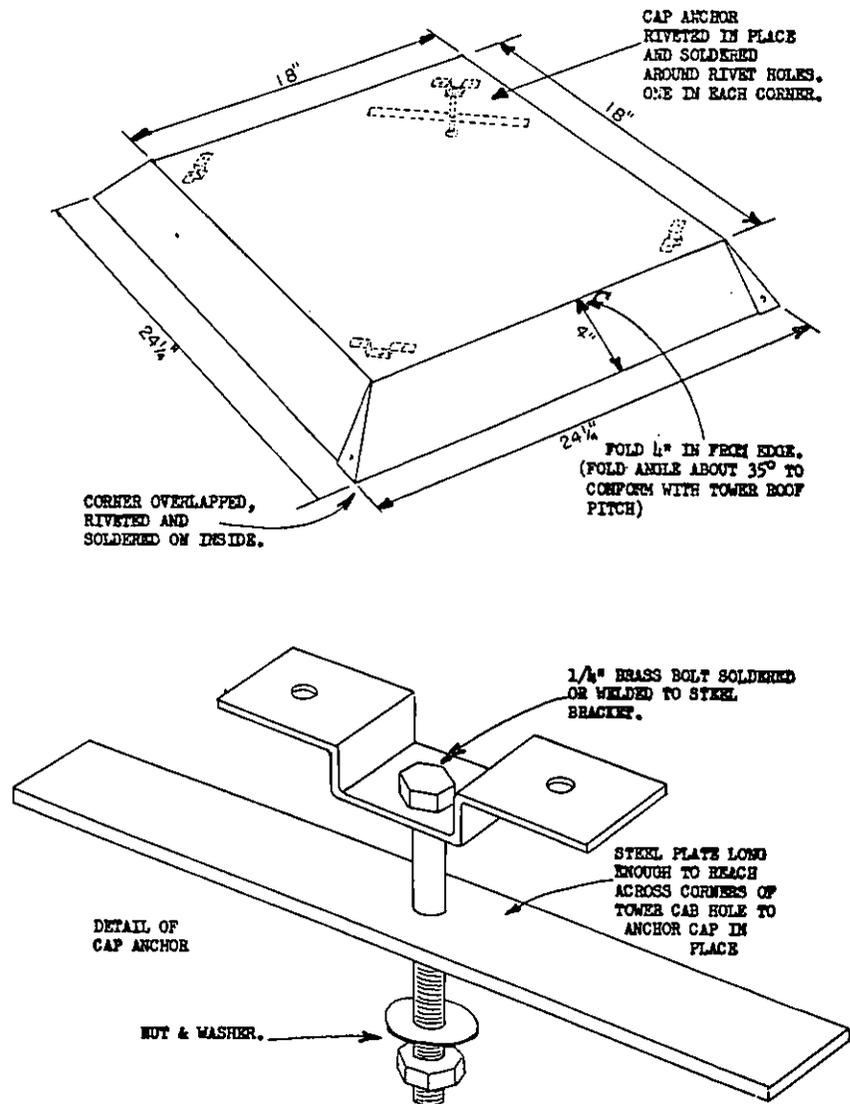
Schematic drawing of cap to cover access hole in roof of 7- by 7-foot tower cab.
